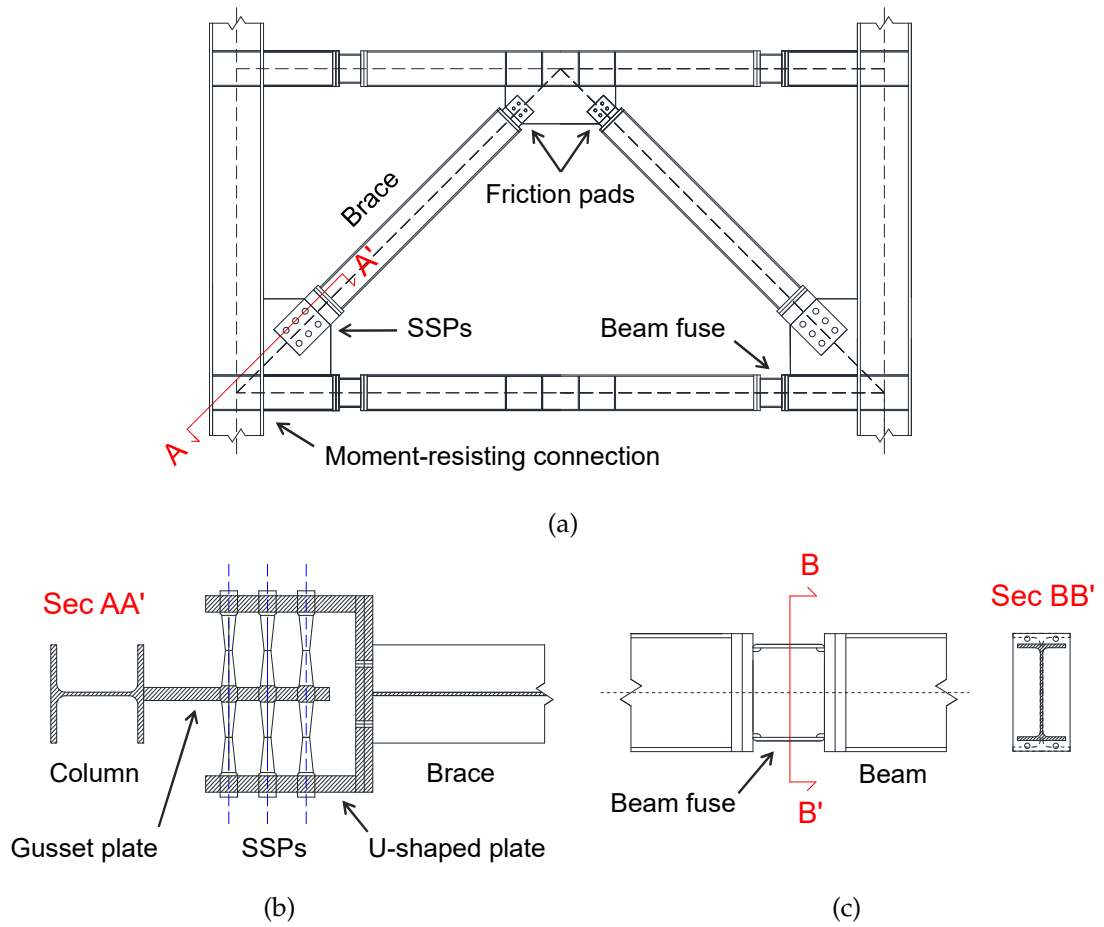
Geometry of the proposed dual CBF-MRF: (a) frame overview; (b) detail of brace-column connection with SSPs; and (c) beam fuse detail
